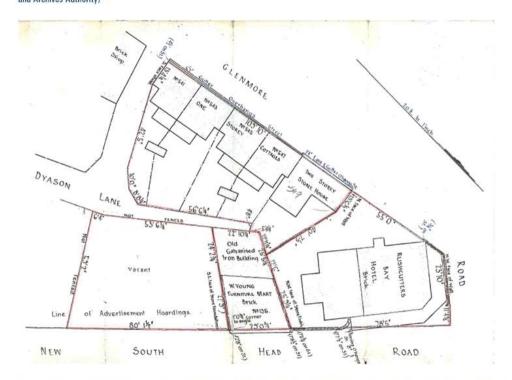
Survey certificate, Rushcutters Bay Hotel 133 New South Head Road, 541-549 Glenmore Road, 18 May 1955, showing the 8" encroachment over the New South Head Road road reserve. (Source: Anglican Archdiocese of Sydney)
